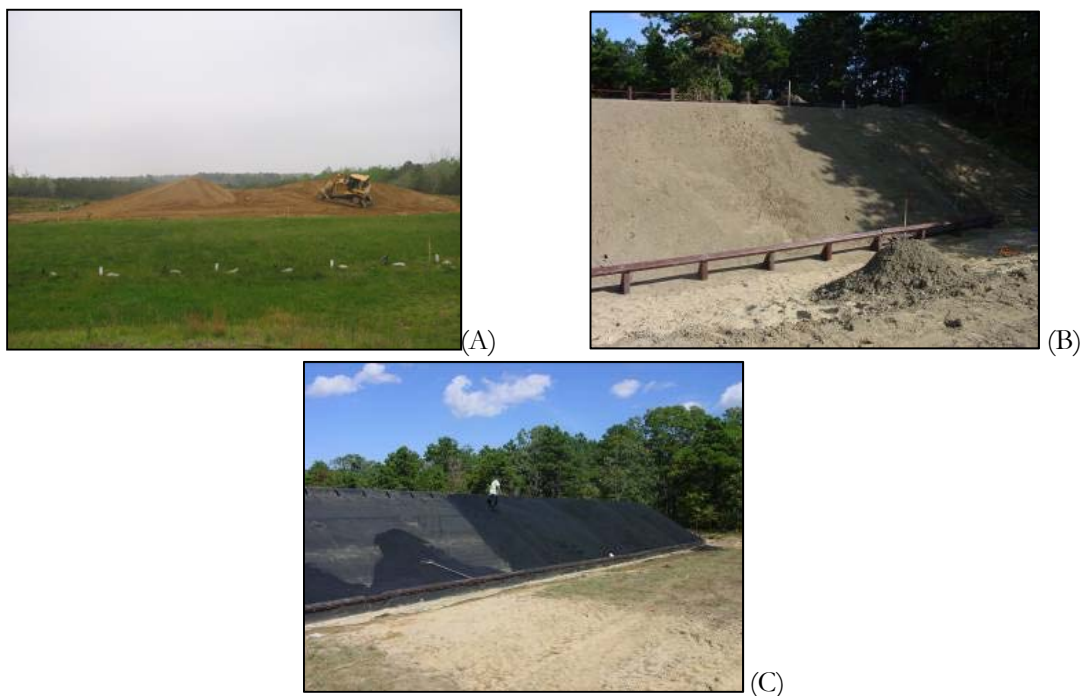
Tango (A), Juliet (B), and Kilo (C) Range Site Work and STAPP System Construction Camp Edwards, Massachusetts.
